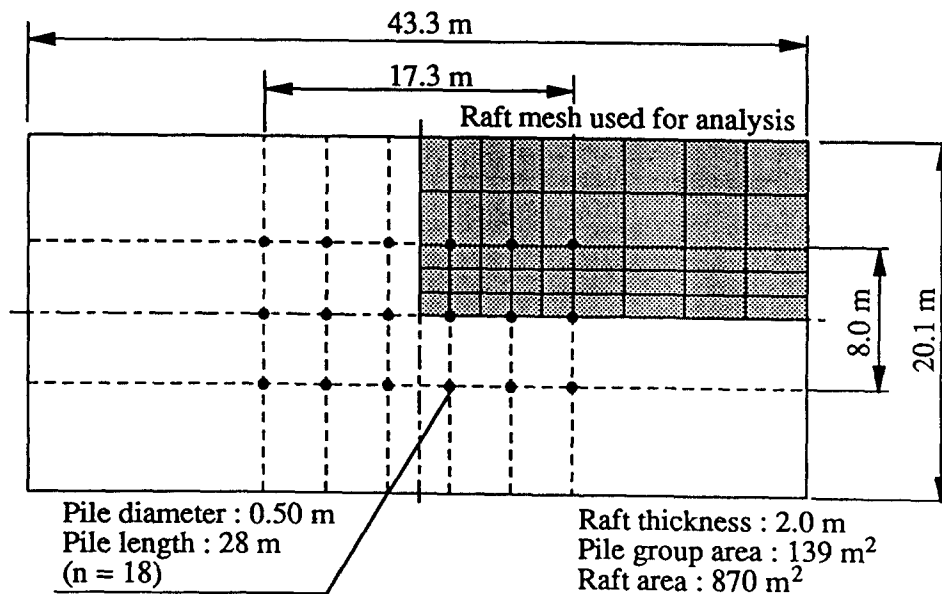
Foundation model for optimum design of Stonebridge Park Flats foundations
